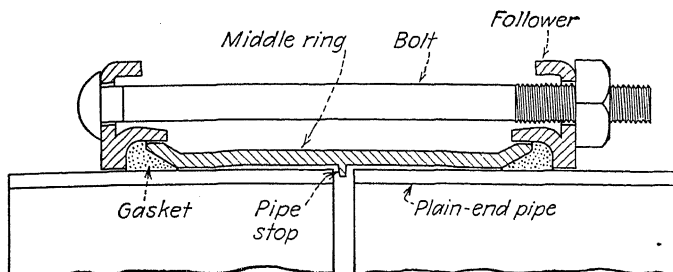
Compression sleeve (Dresser) coupling for use with plain-end cast-iron or steel pipe for gas, oil, or water mains. (Courtesy of Dresser Manufacturing Company.)
